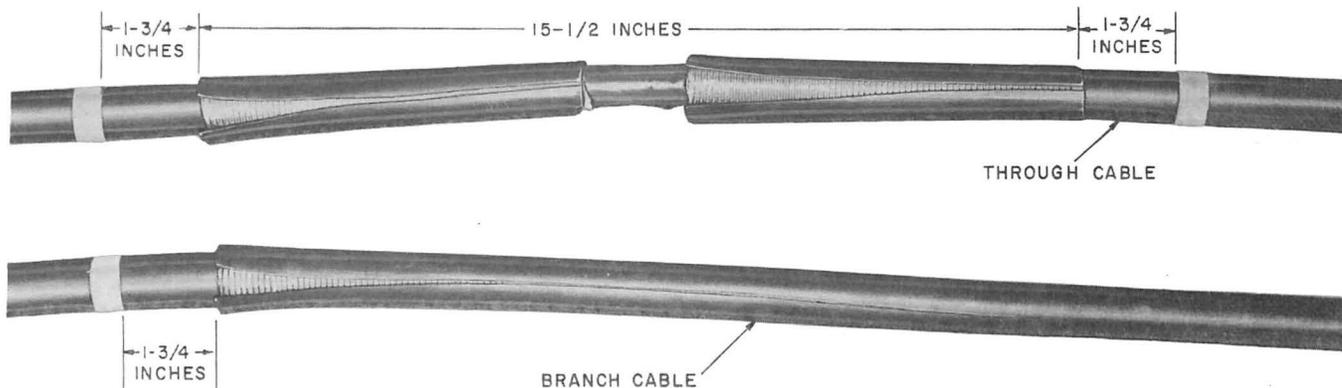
Polyethylene Sheath—Marked, Cut, and Ready for Removal
